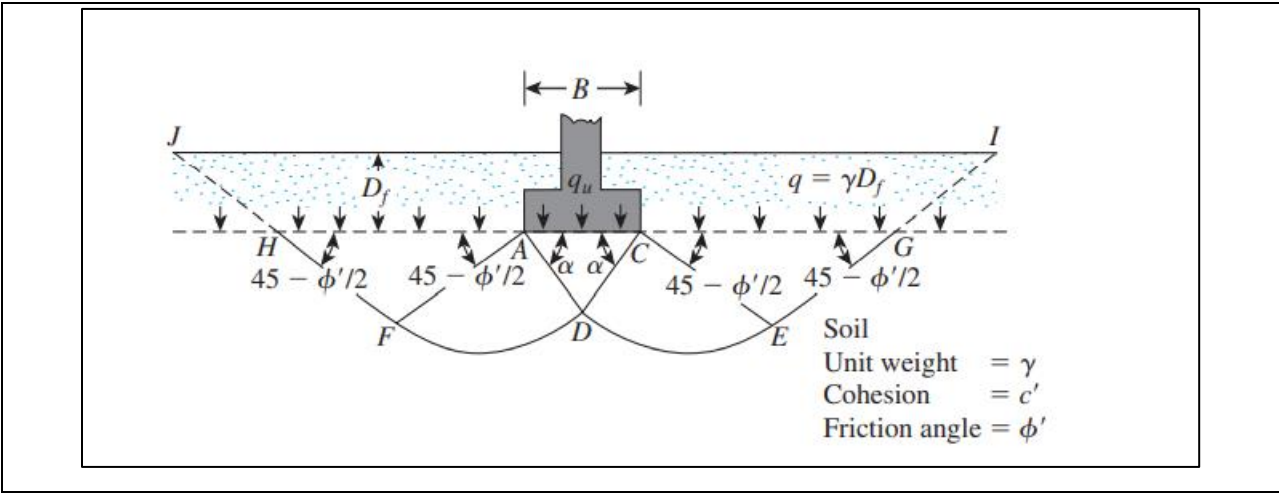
Failure Of Bearing Capacity In Soil Beneath A Rough Rigid Constant (Strip) Foundation [50]
